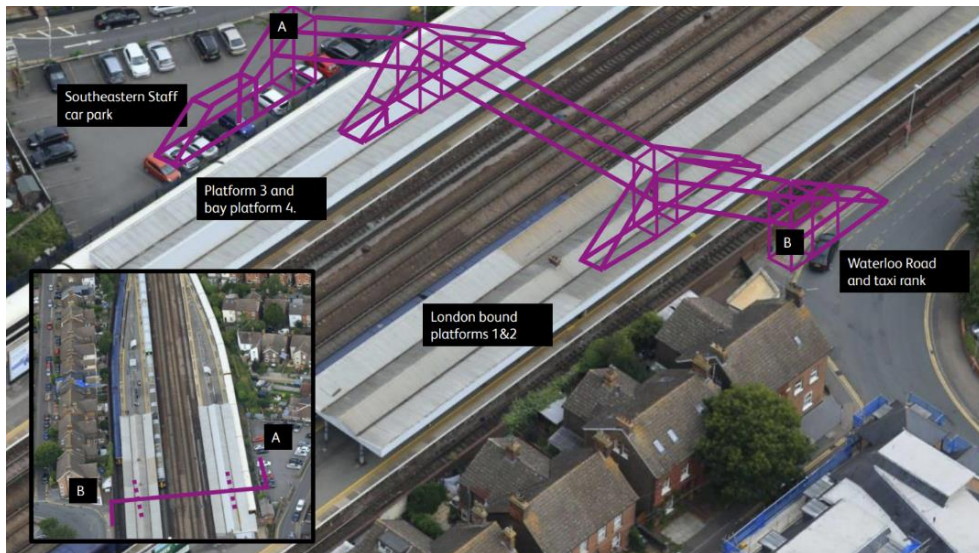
A 3D view of the potential locations of where lift shafts/staircases could be located for a footbridge linking the north and south sides of the railway station together. Source: Network Rail.
